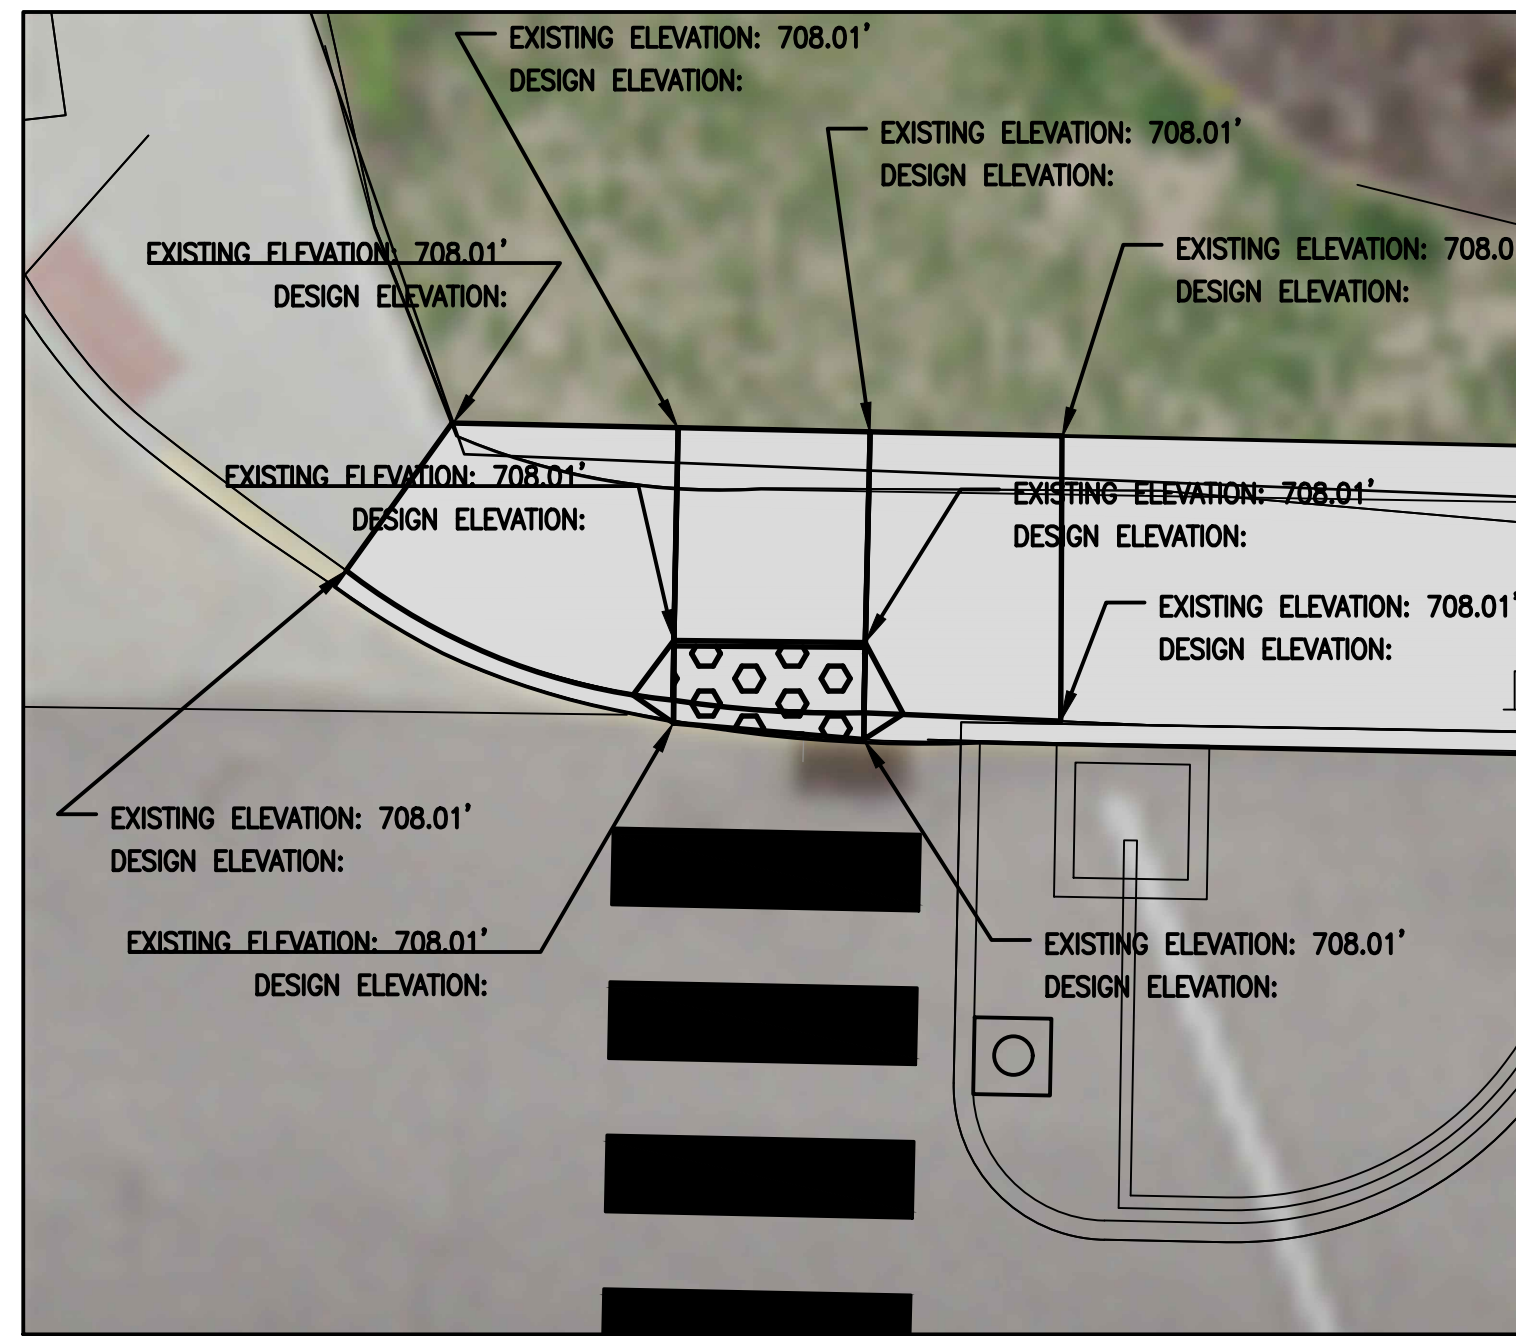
CROSSWALK MARKINGS (TYP.)
